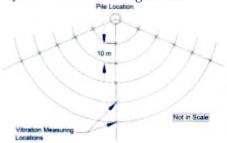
Survey plan for measuring of ground vibrations on a piling site
